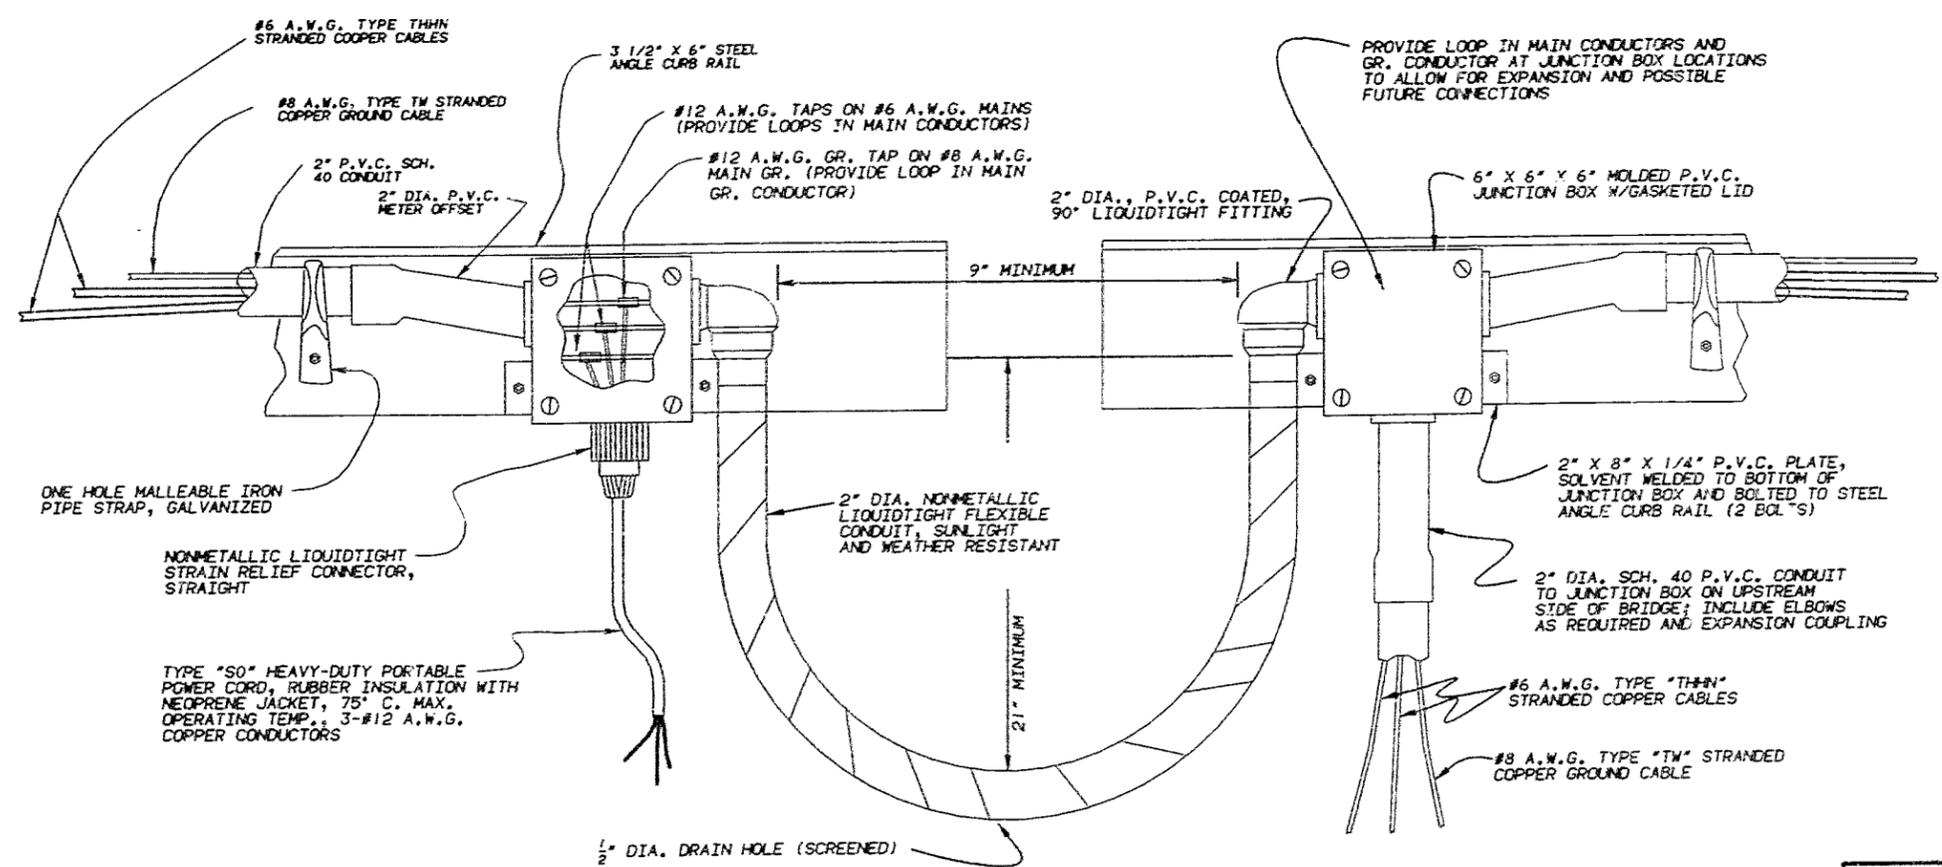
DETAIL OF NAVIGATION LIGHT POWER CORD CONNECTION AT JUNCTION BOXES
